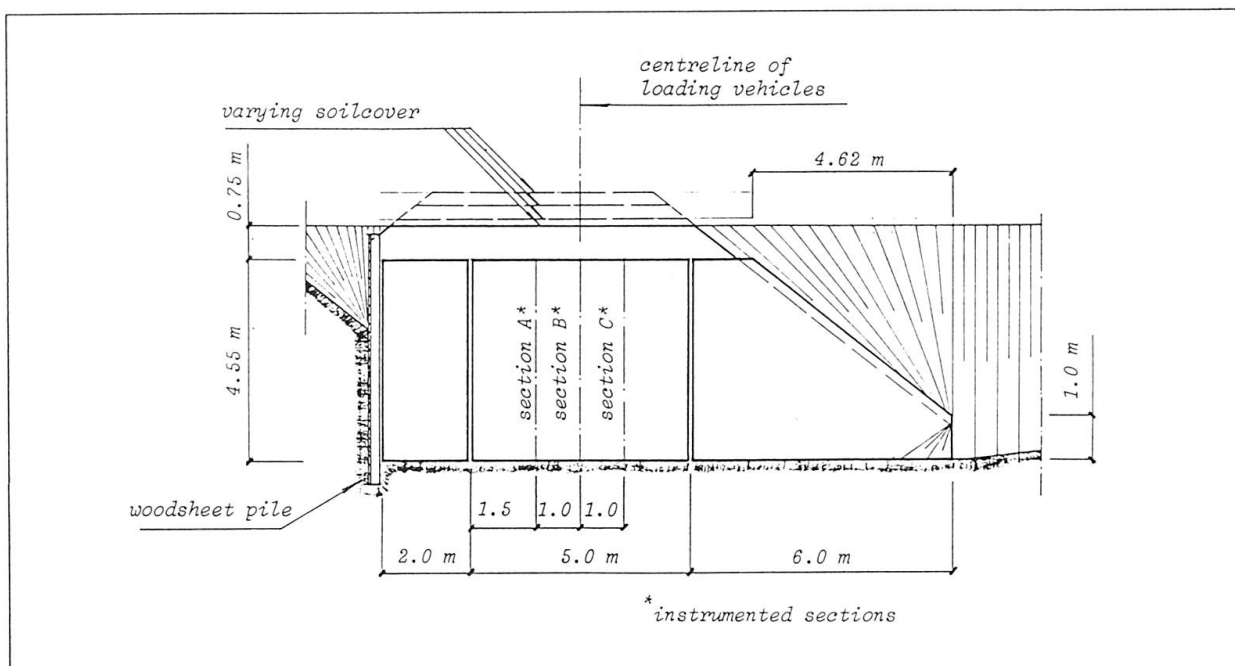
Longitudinal section through test culvert showing instrumented sections.
